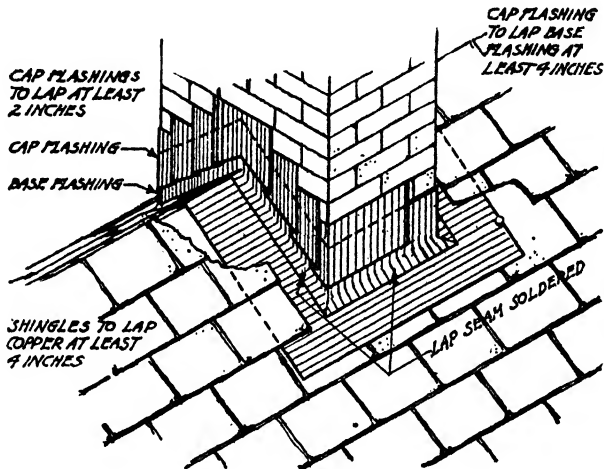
Recommended flashings of chimney extending through ridge of roof.
